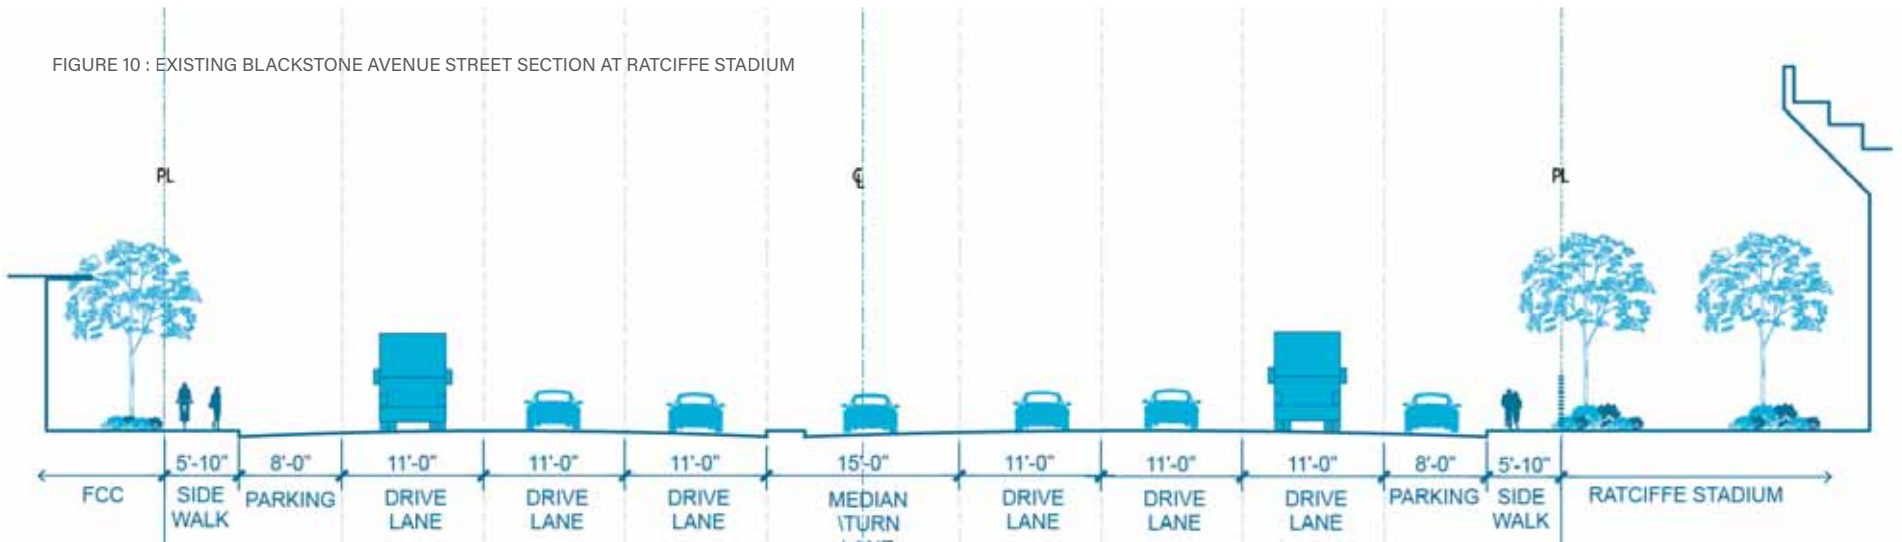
EXISTING BLACKSTONE AVENUE STREET SECTION AT RATCIFFE STADIUM
